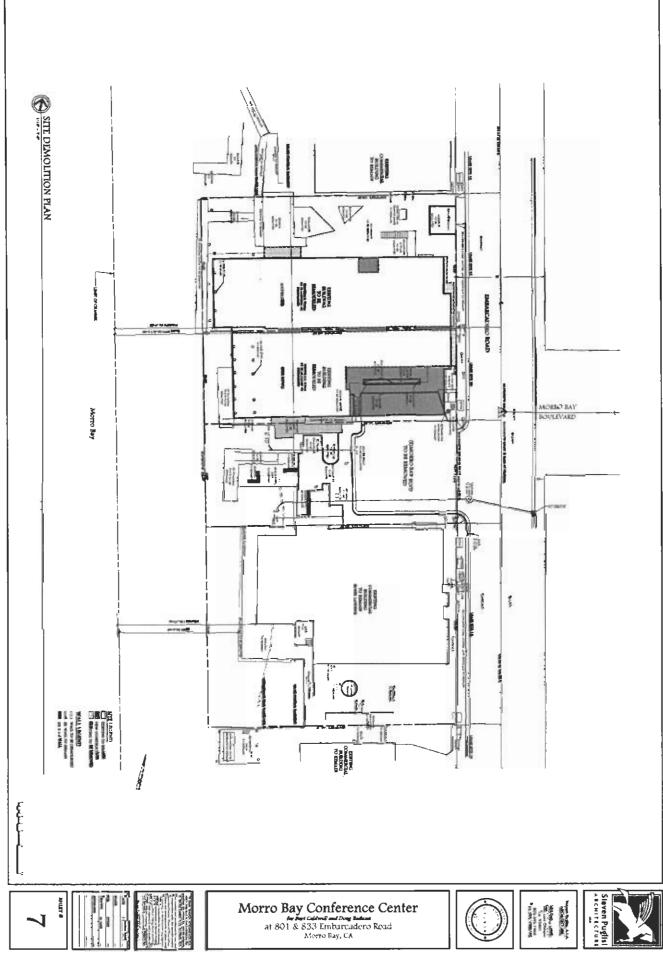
Exhibit B Proposed Site Plans and Elevations Page 5 of 7
